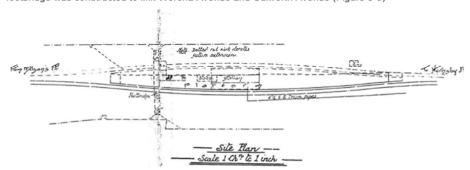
Station layout, c. 1906 (Sydney Trains Virtual Plan Room)
